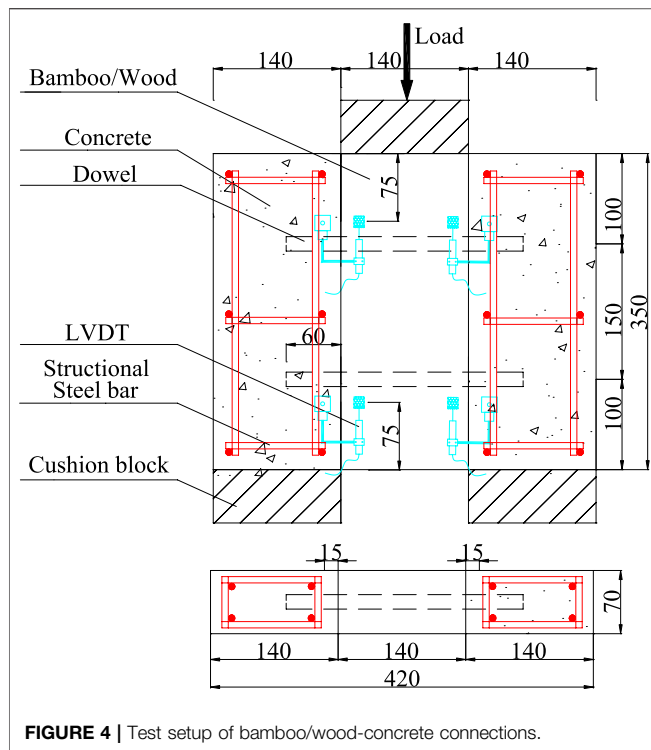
| Test setup of bamboo/wood-concrete connections.
